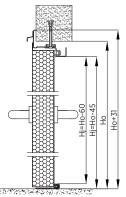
Installation of a single-leaf door to a masonry wall – corner frame with a thermal break – vertical cross-section
